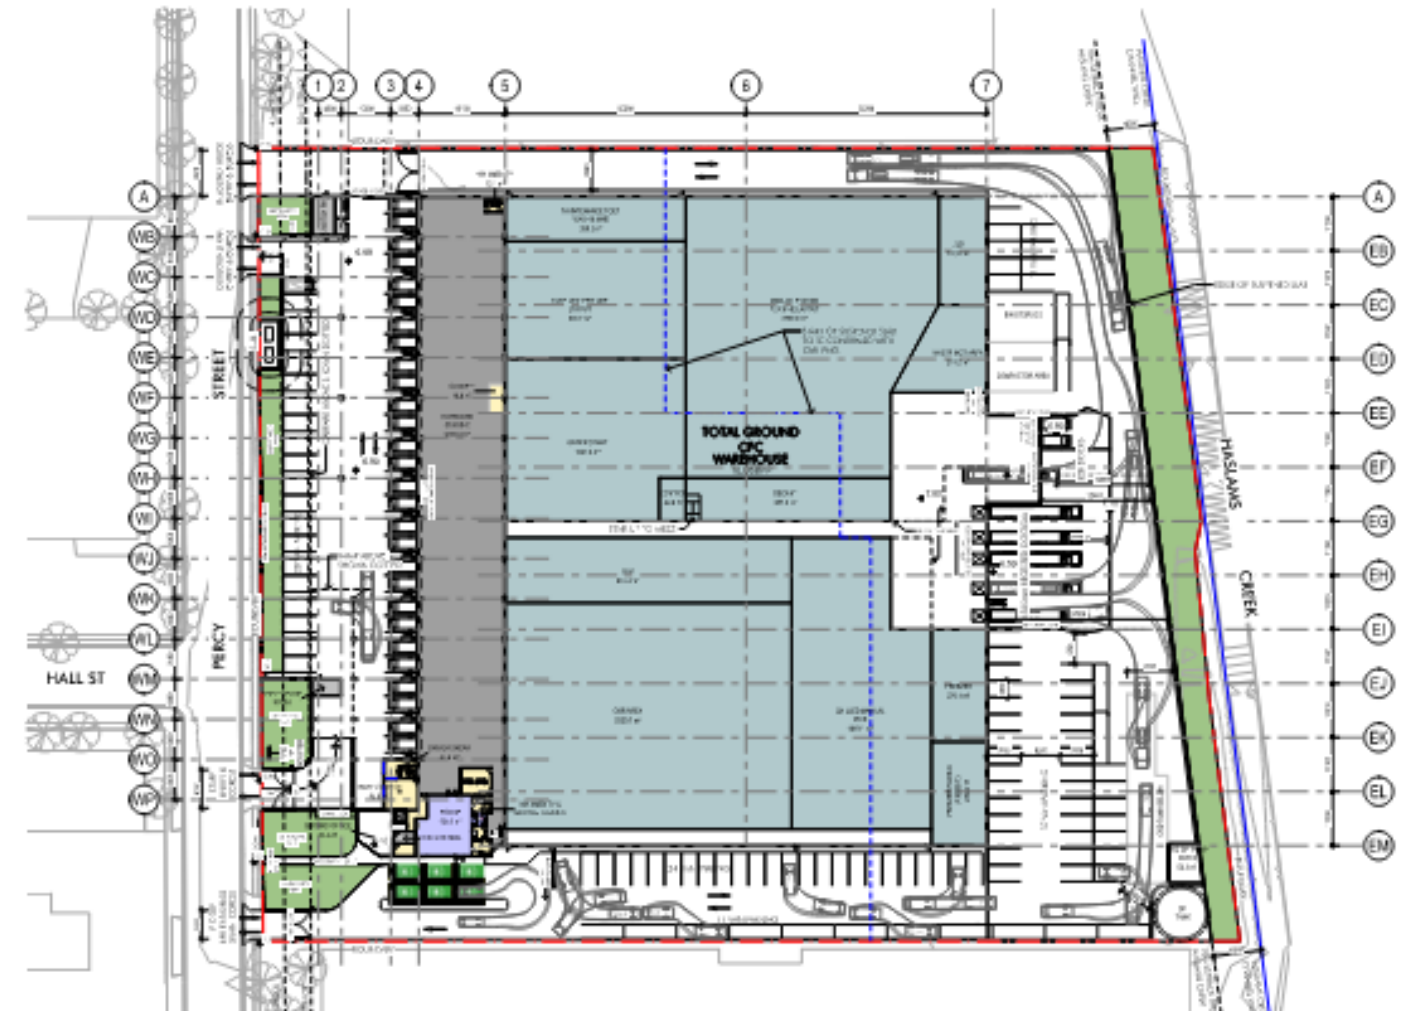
Ground Floor Plan of the proposed development (provided by Nettleton Tribe)
